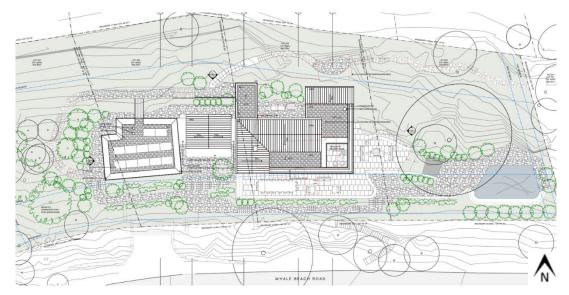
Proposed roof plan, Extract from Roof Plan (Source; Drawing No. 1105, Rev. A)
